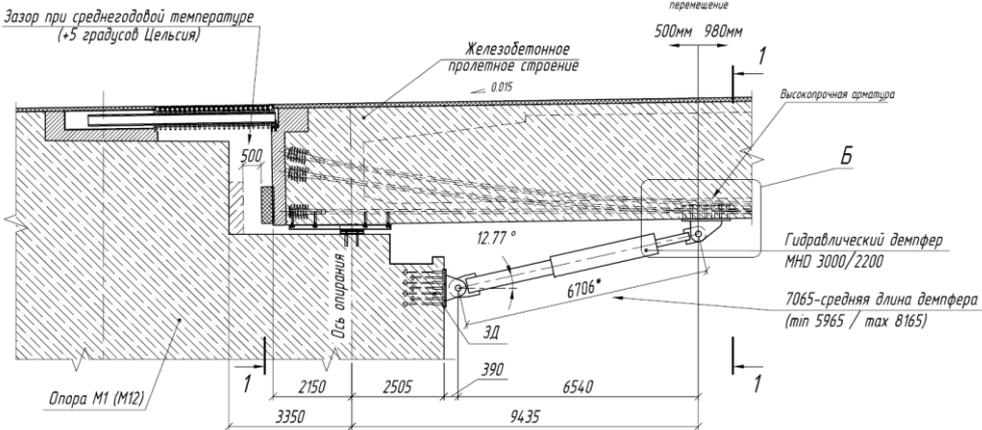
Arrangement of the viscous damper between bridge deck and abutment
